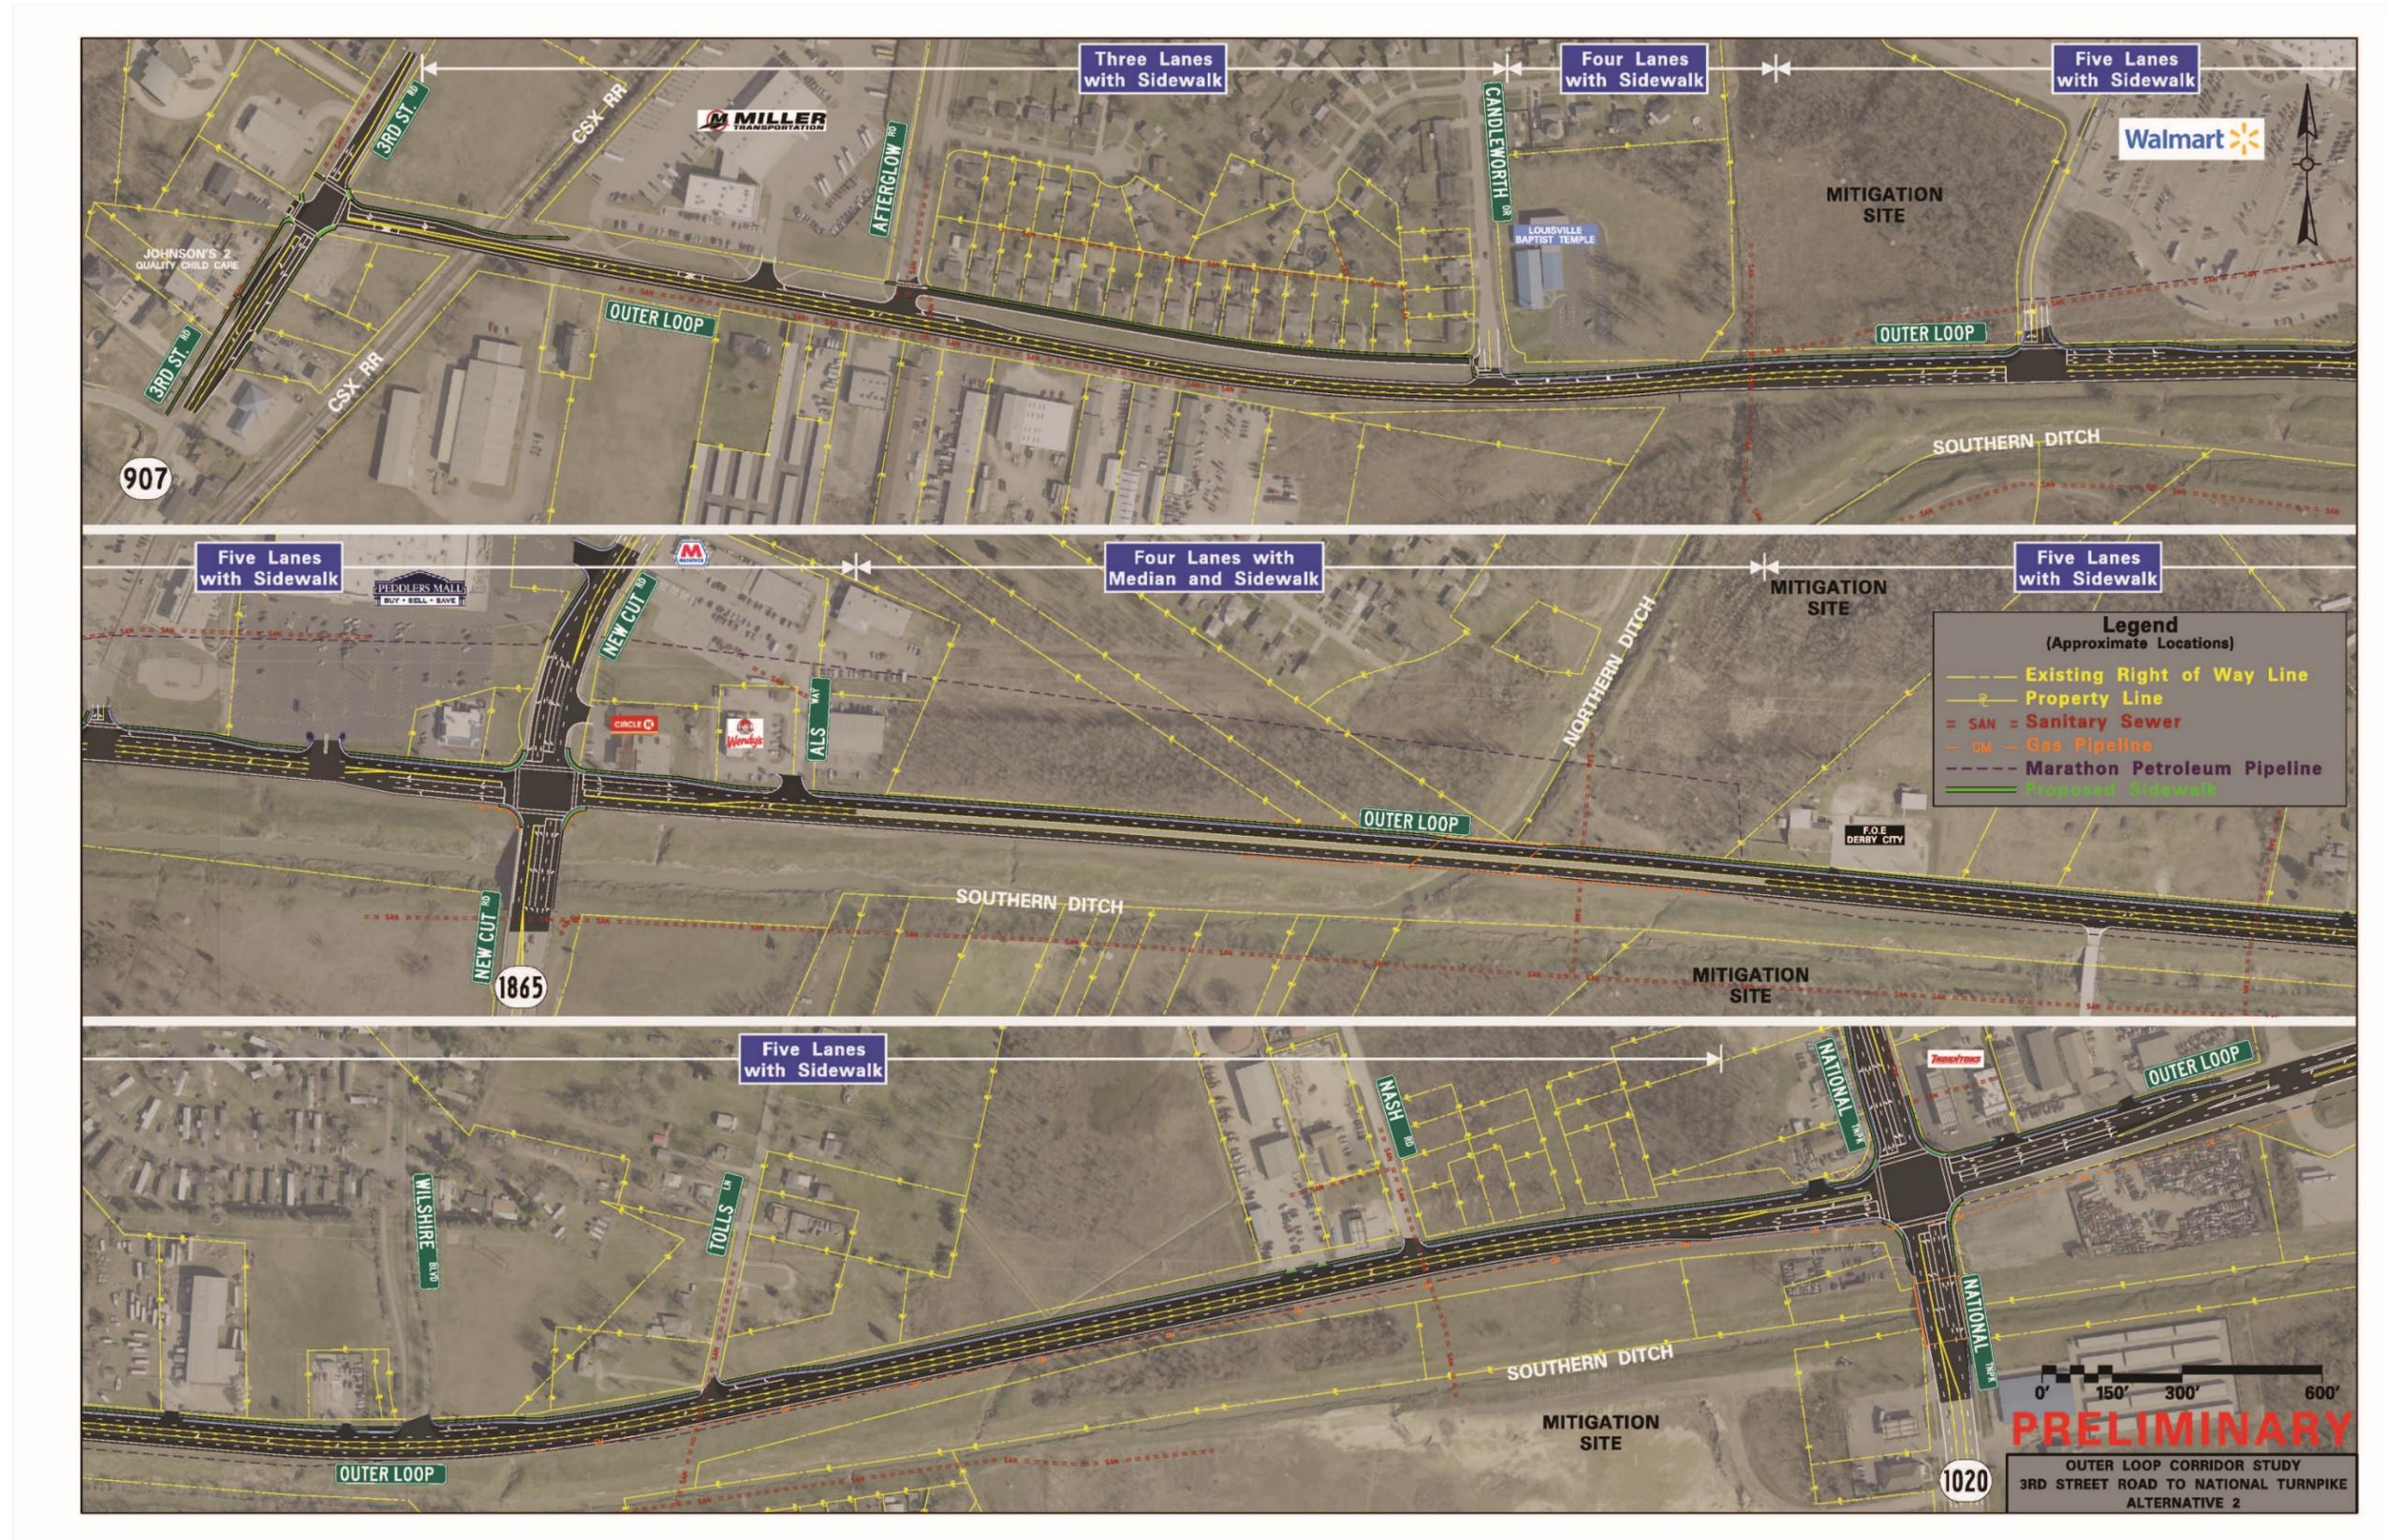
Alternative 2—3-5-4-5 in Greater Detail
